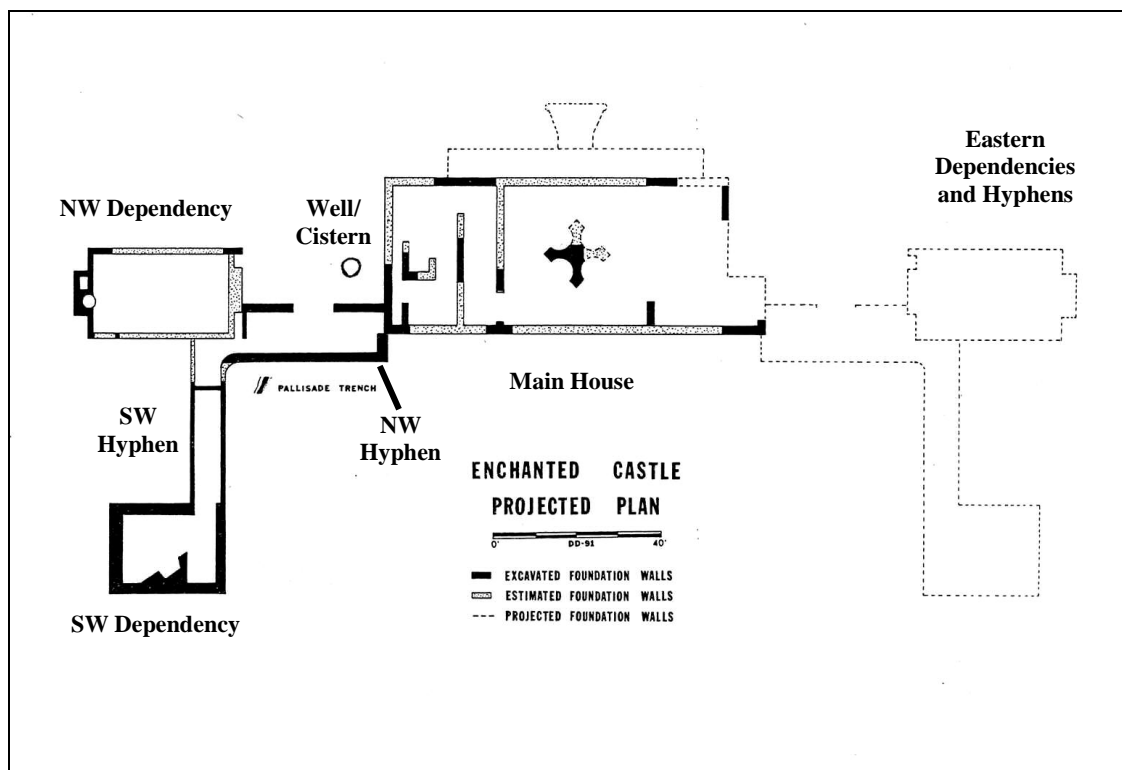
Projected plan map of the Enchanted Castle, showing the main house, outbuildings, and dependencies (On file, MWC, CHP).
